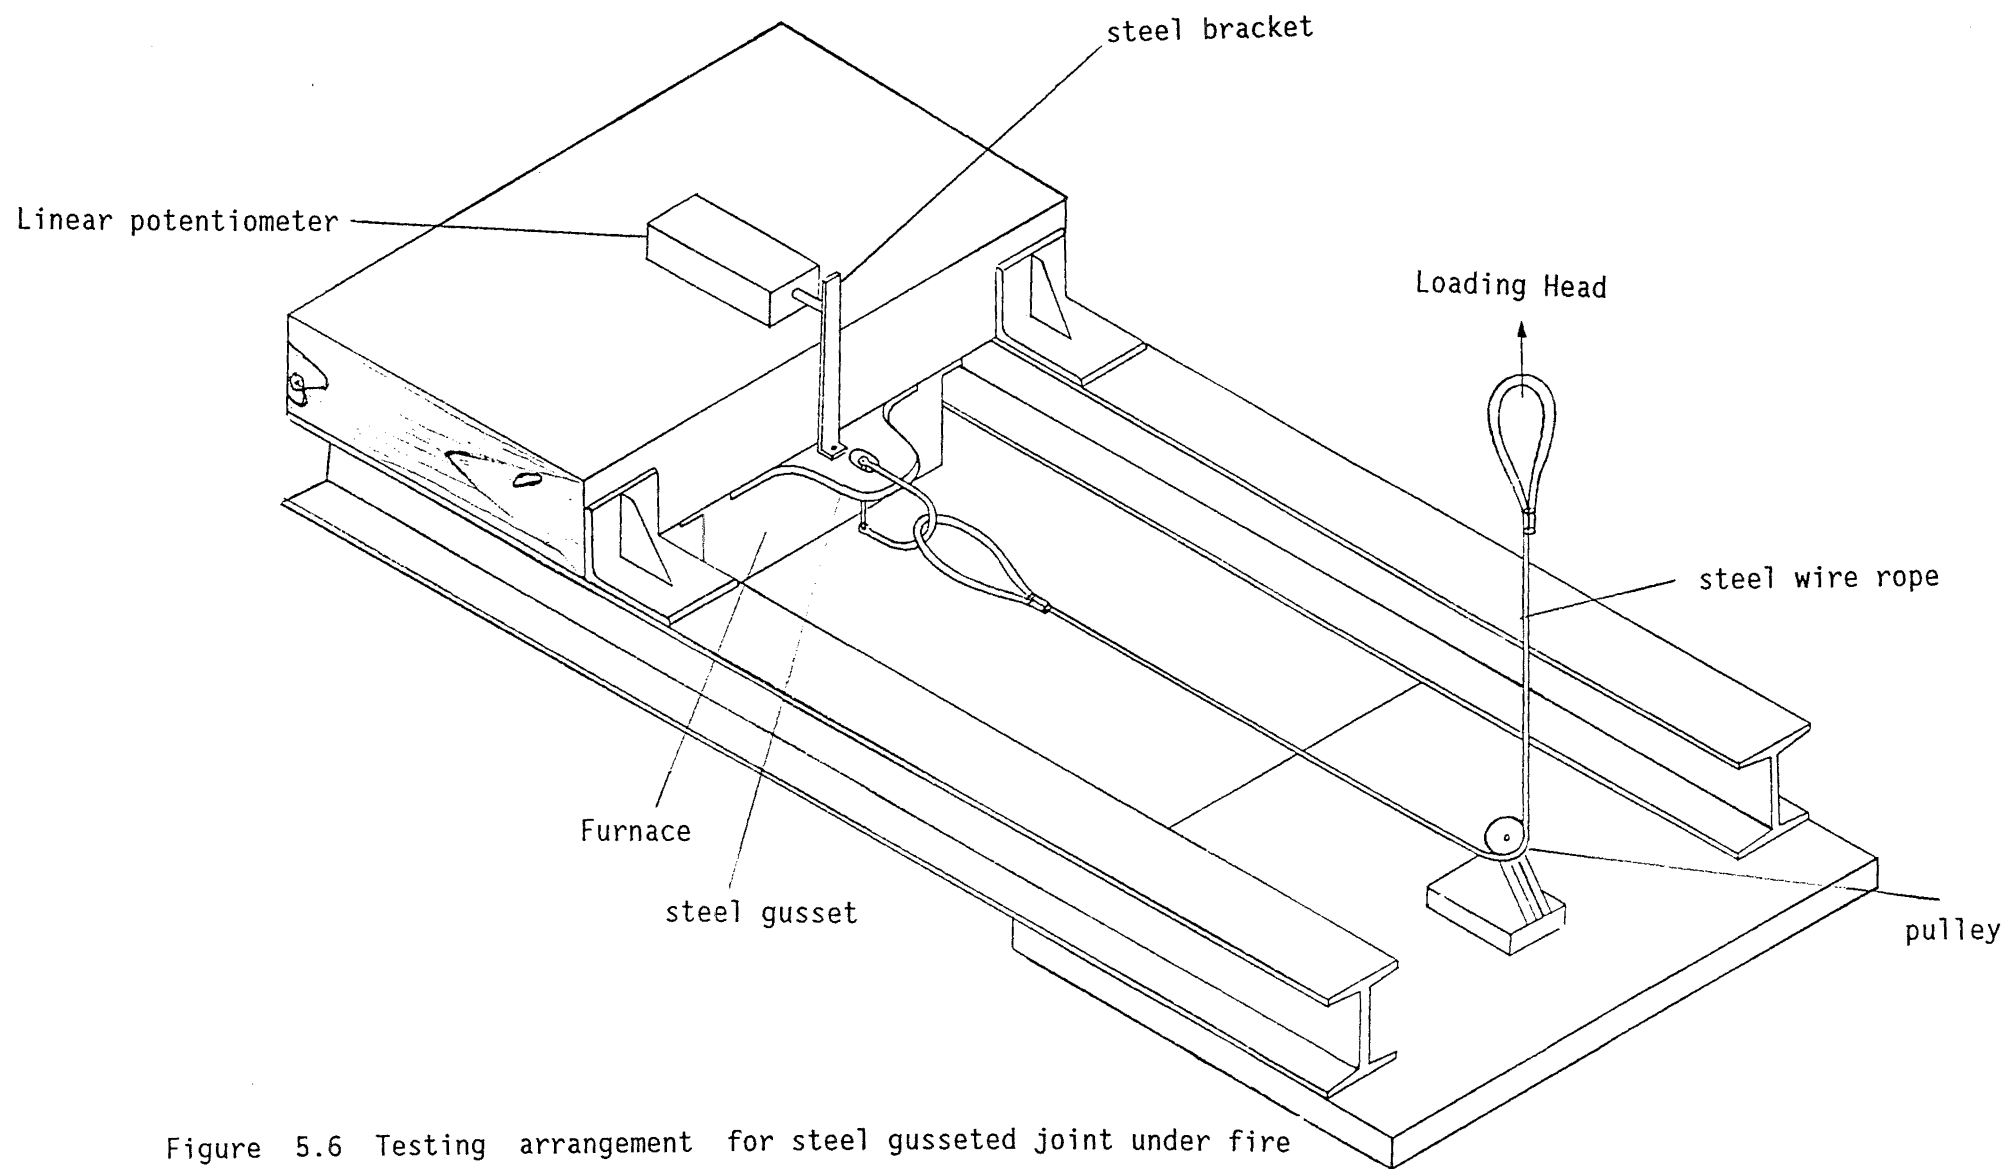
Testing arrangement for steel gusseted joint under fire conditions
